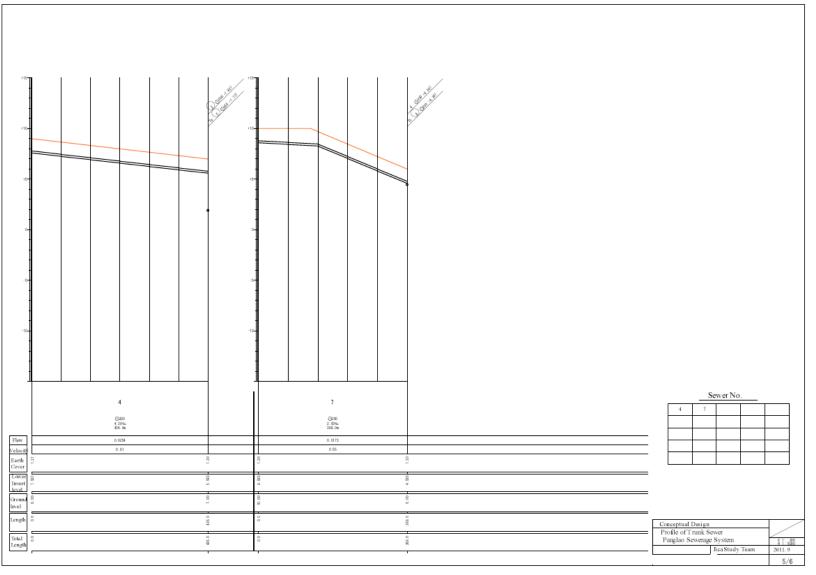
Profile of Trunk Sewer (Panglao Sewerage System)
